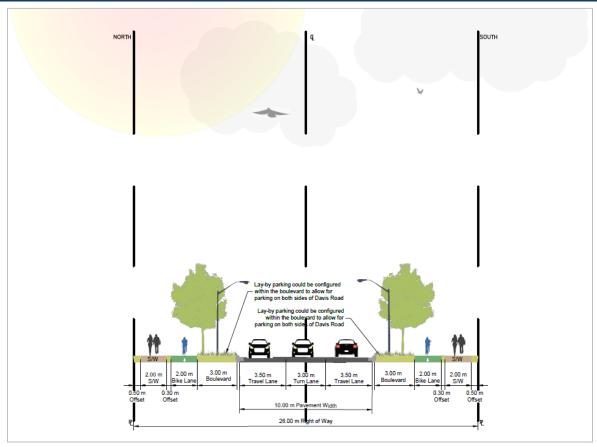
Davis Road Extension (E-W Collector Road), 26.0 m ROW
